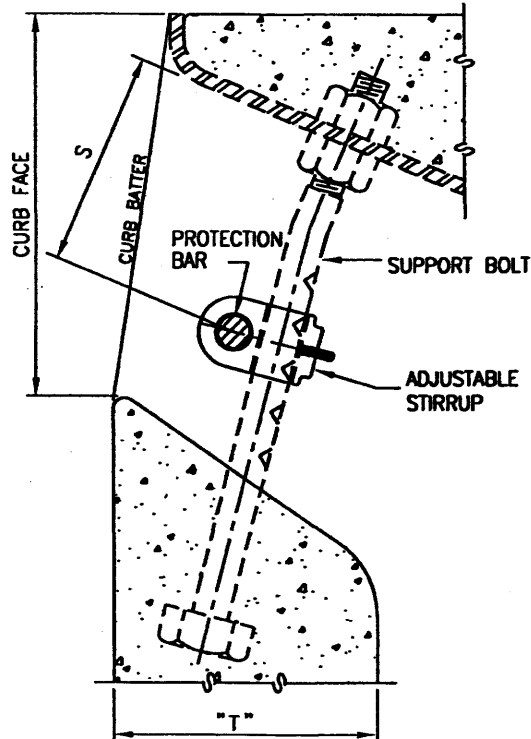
DETAIL OF CATCH BASIN OPENING		STANDARD PLAN 2002
